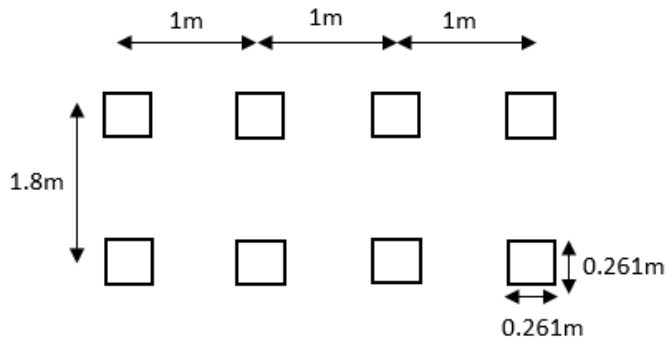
Wheel arrangement of HB vehicle that load transfer on to culvert
